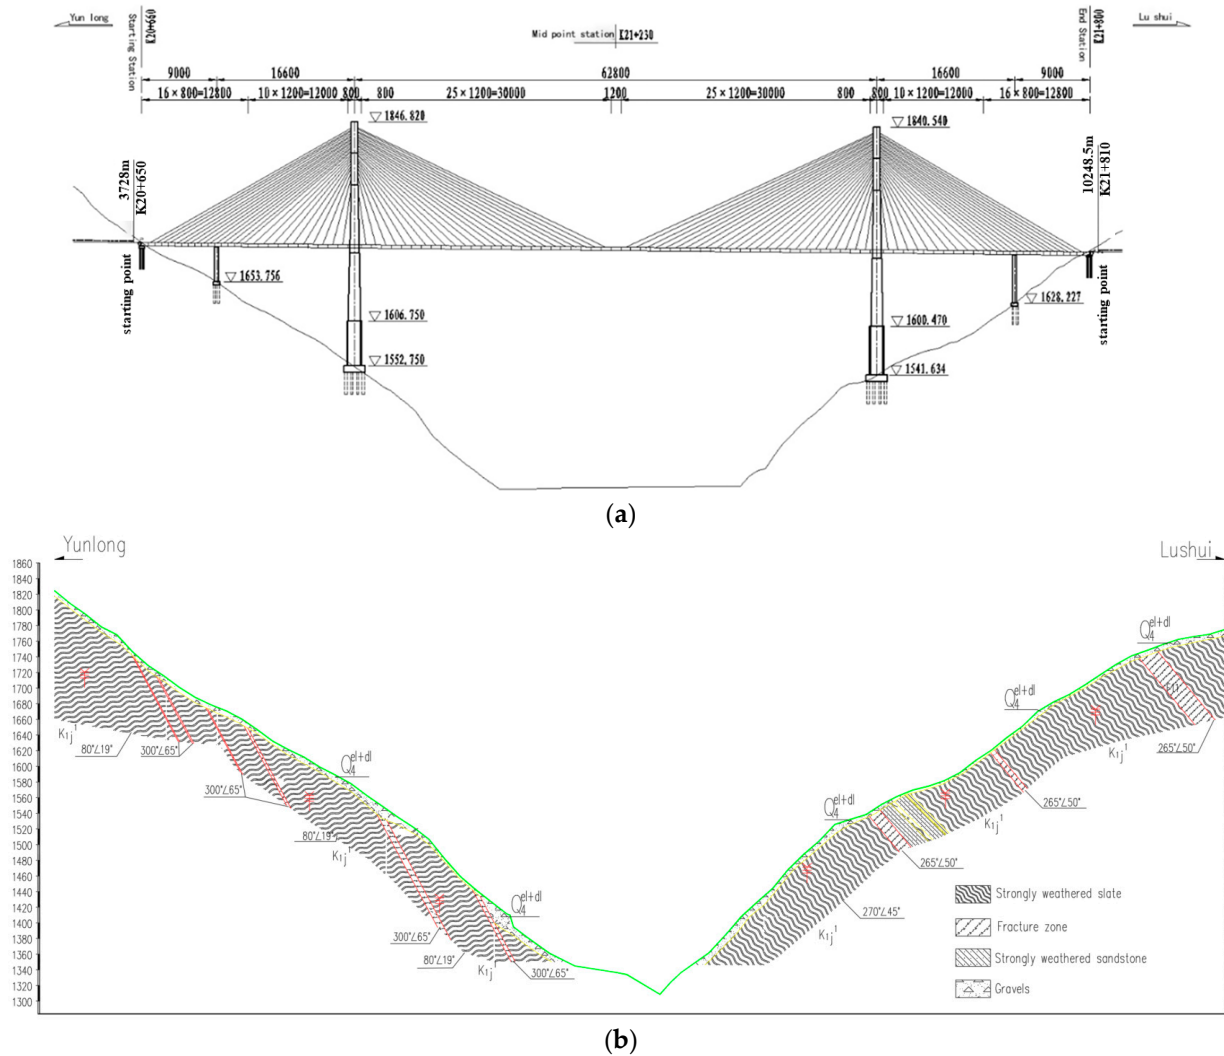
Schematic diagram of bridge location (scheme 1). (a) Schematic diagram of bridge type; (b) geological section of bridge site area.
